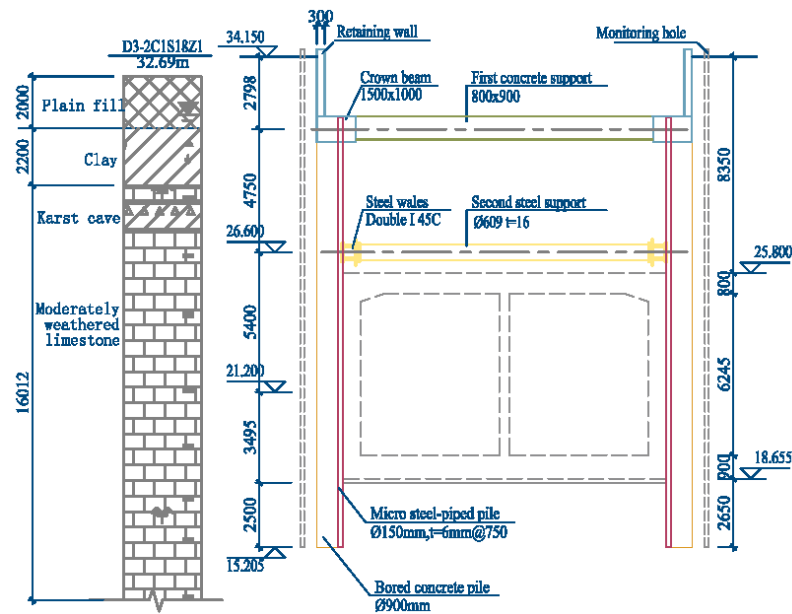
Design of the retaining structure for Hou Pantao Village Station Foundation Pit
